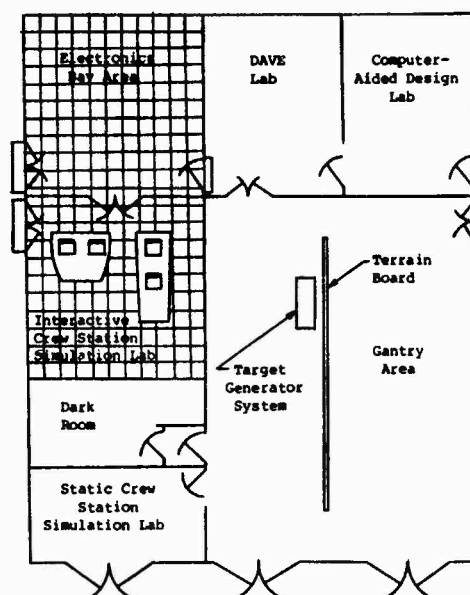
Crew Station Evaluation Facility (CREST) Floor Plan
